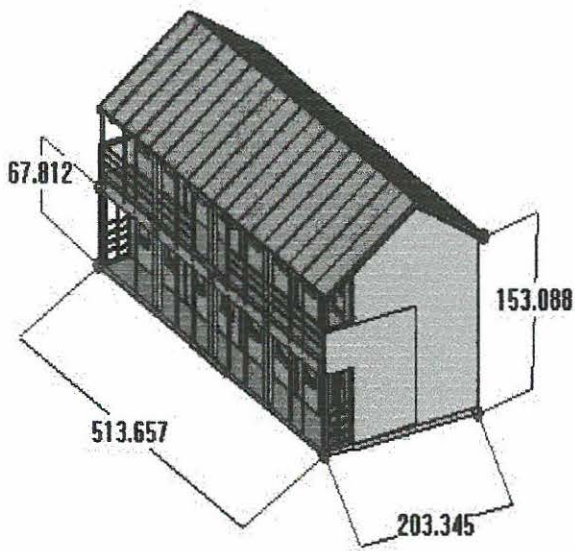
Dimension drawing of prototype (1:1) Fig. 7.31 Prototype on laser cutter (scale 1:1)
